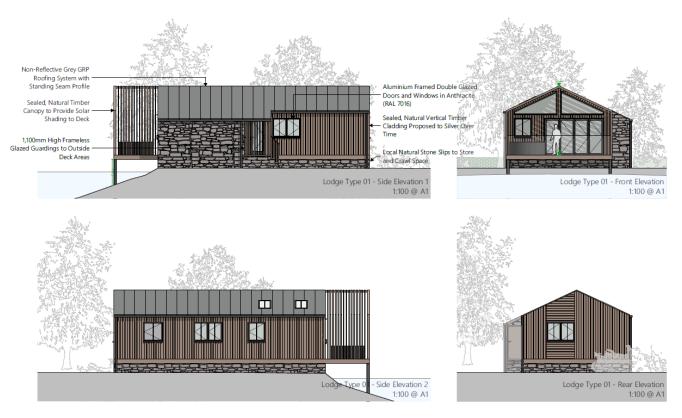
Typical Lakeside Lodge Elevations - Not to scale
